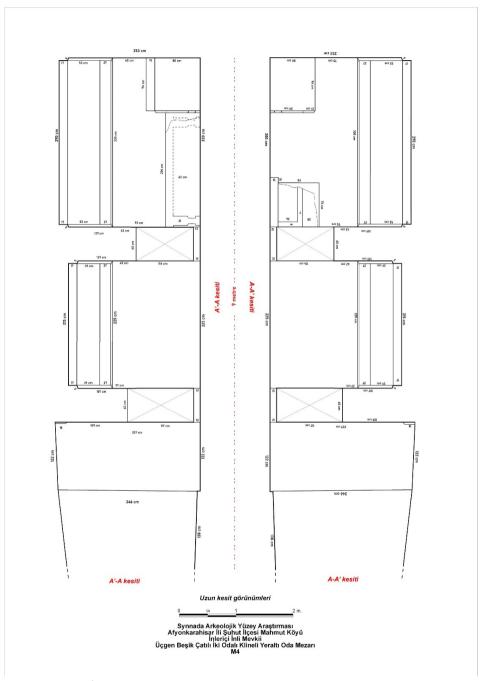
İnli M4 drawing, plan and cross-section view of rock-cut tomb (i.baytak)
